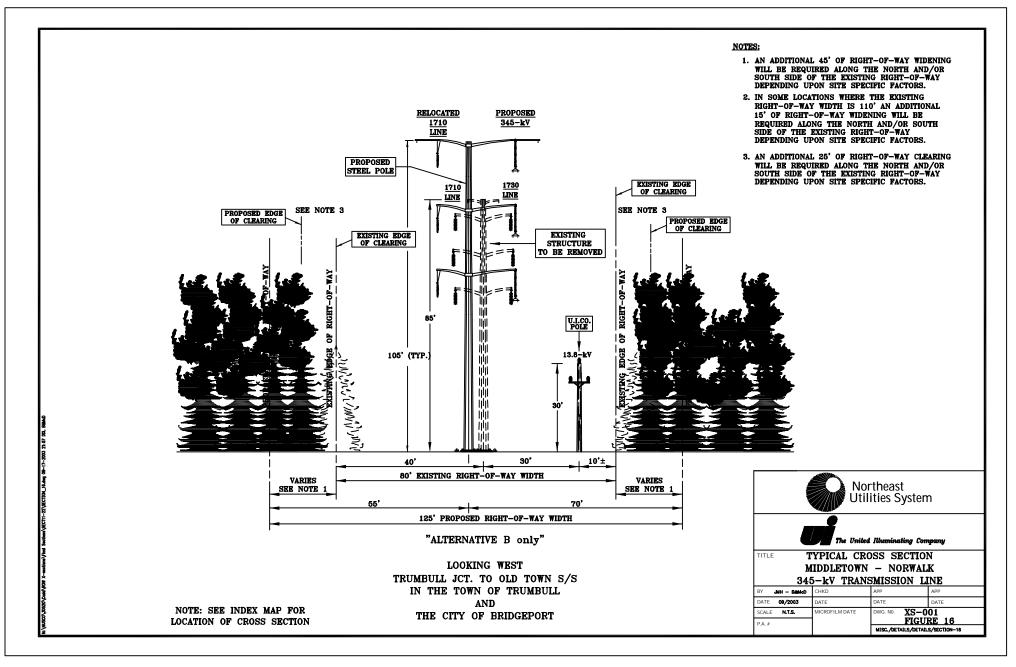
Cross section 16 - Trumbull Junction to Old Town Substation (Trumbull, Bridgeport) (Alignment of proposed structure on ROW may vary slightly along route)
